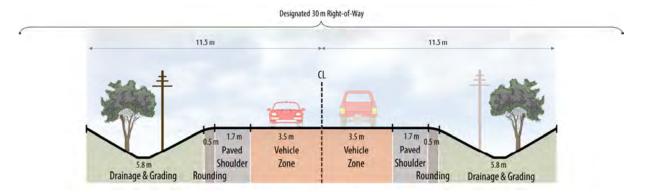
11.4 m Platform Rural Cross-Section for Olde Base Line Road
